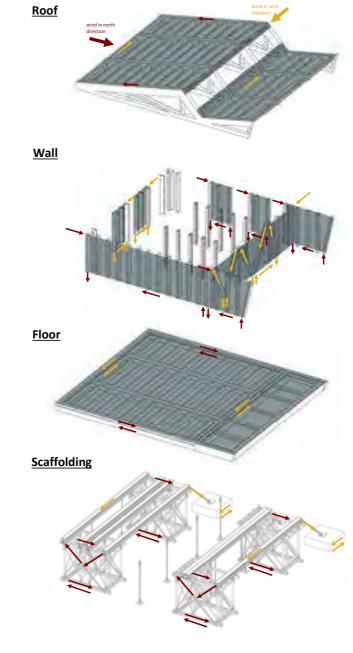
46. Structural design HDU – force diagram horizontal loads
